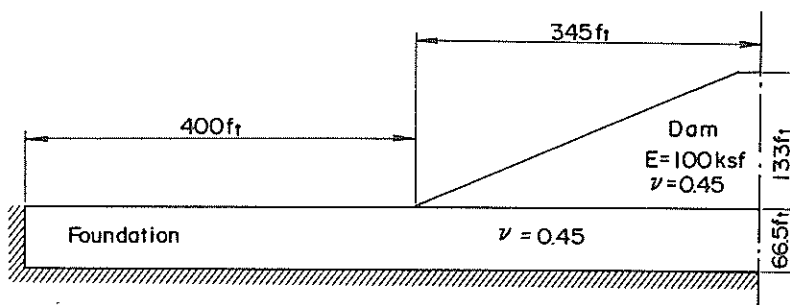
Foundation-embankment system (after Clough and Woodward³⁾)
